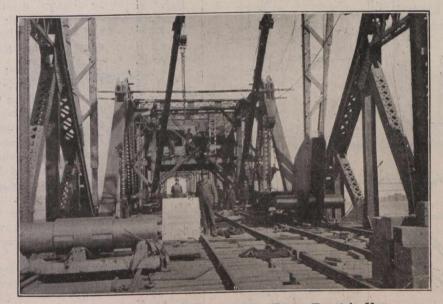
Looking from Counterweight Tower Towards Moving Leaf. Showing Erection Traveller About to Raise Counterweight Trunnions to Place.
